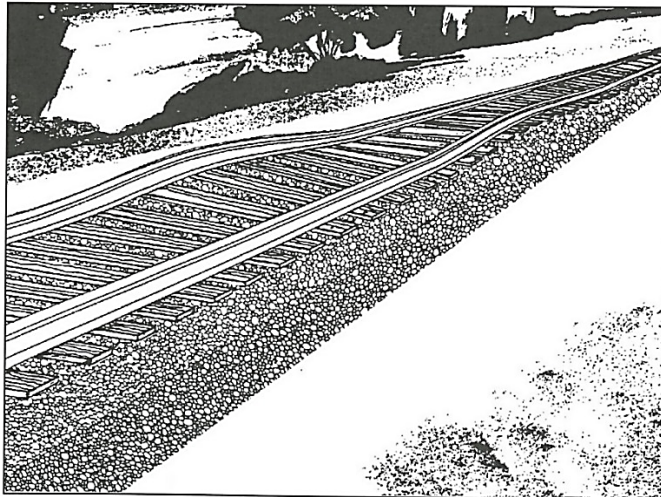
Figure SUB-PART C – 26 – Surface Defect Example
